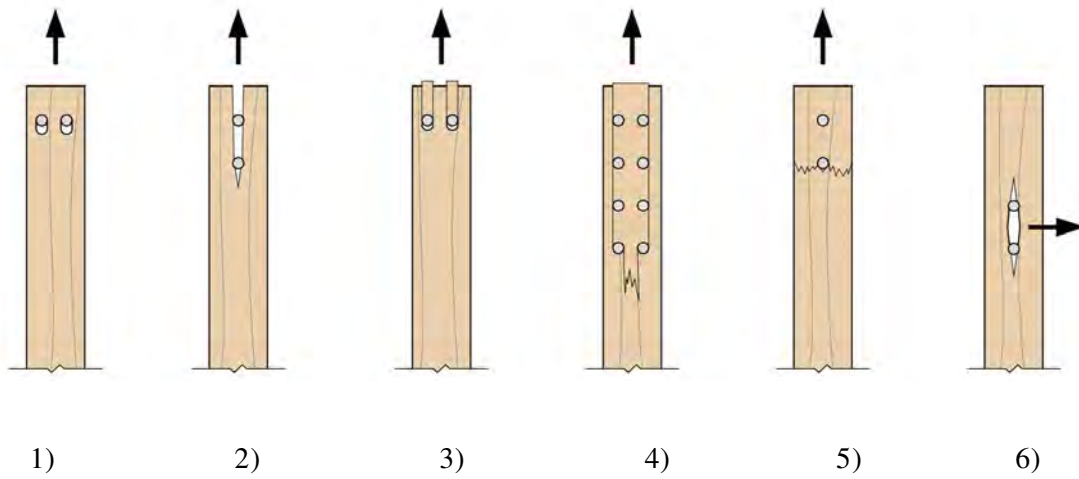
Basic failure modes for wood in steel-to-wood dowel type connection.
